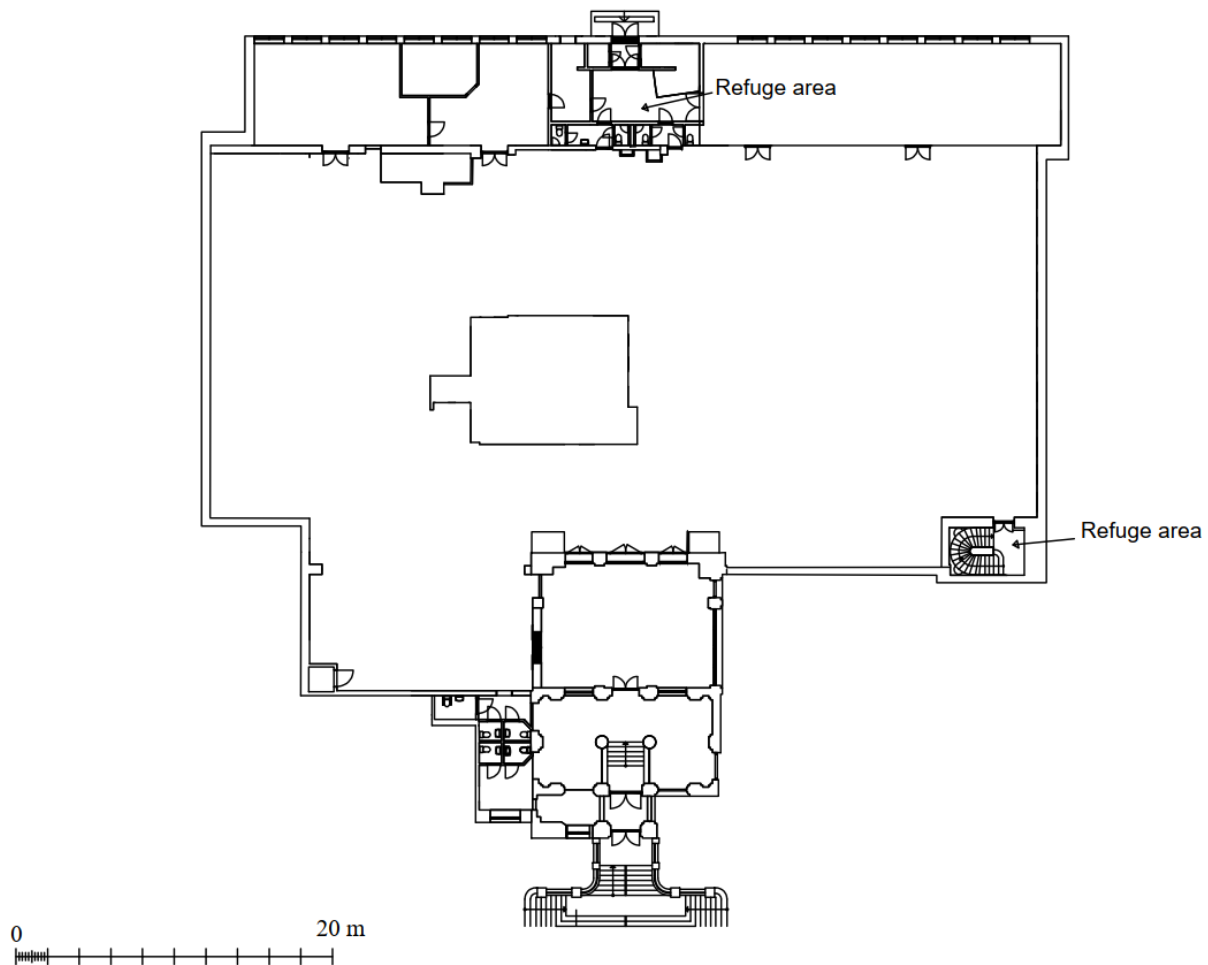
Entry level floor plan of the fictitious building used in the case study. Note that there was one additional emergency exit located on the floor below that can be reached through the stair in the lower right part of the figure. The third refuge area is located on the floor below as well.
